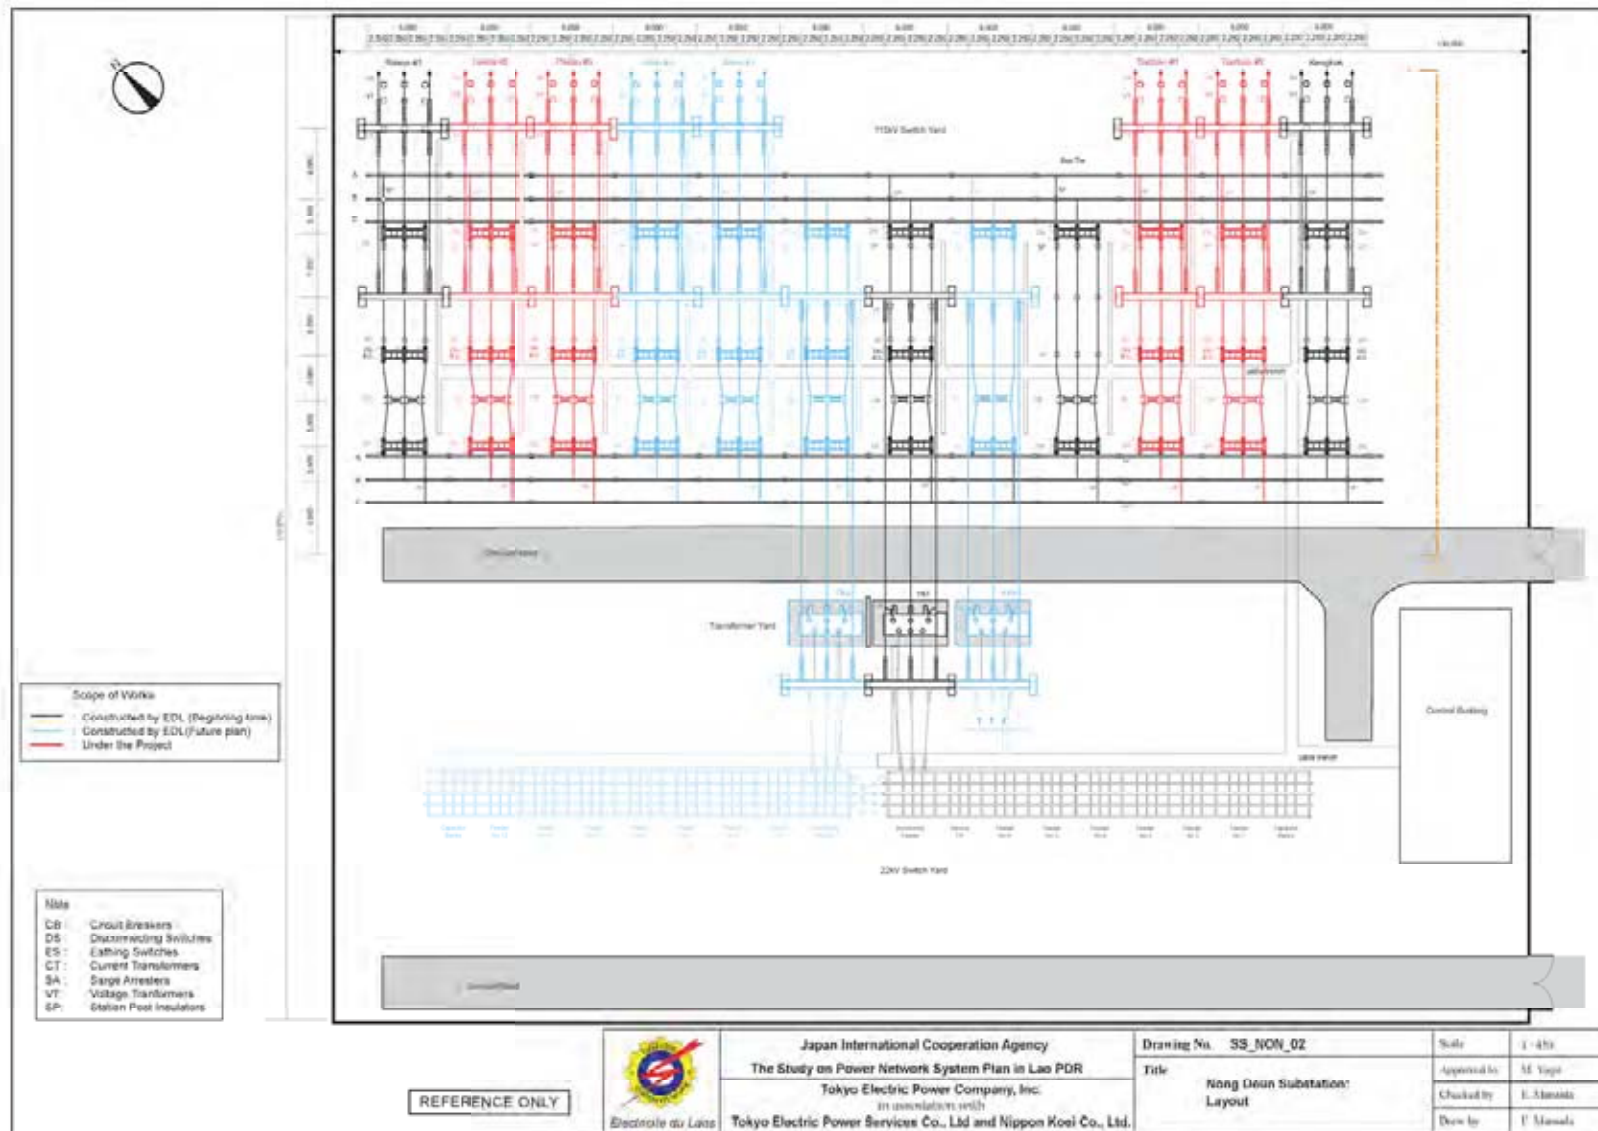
Drawing No. SS_NON_02: Nongdeun Substation – Layout
